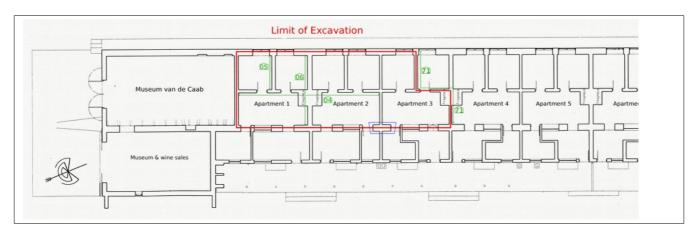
Plan of building prior to the current redevelopment showing internal divisions of six farmworker apartments and the Museum van de Caab in the northern section.
